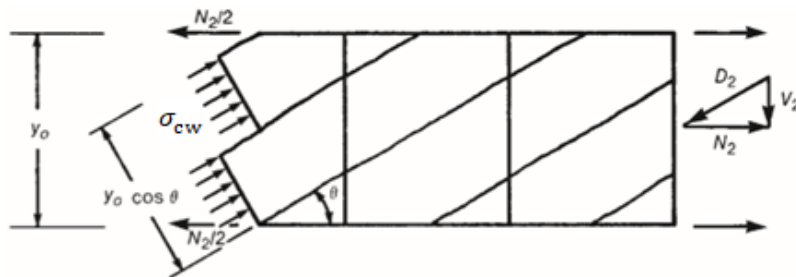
Section of a vertical wall of the truss detailing the chords and struts forces [12].
